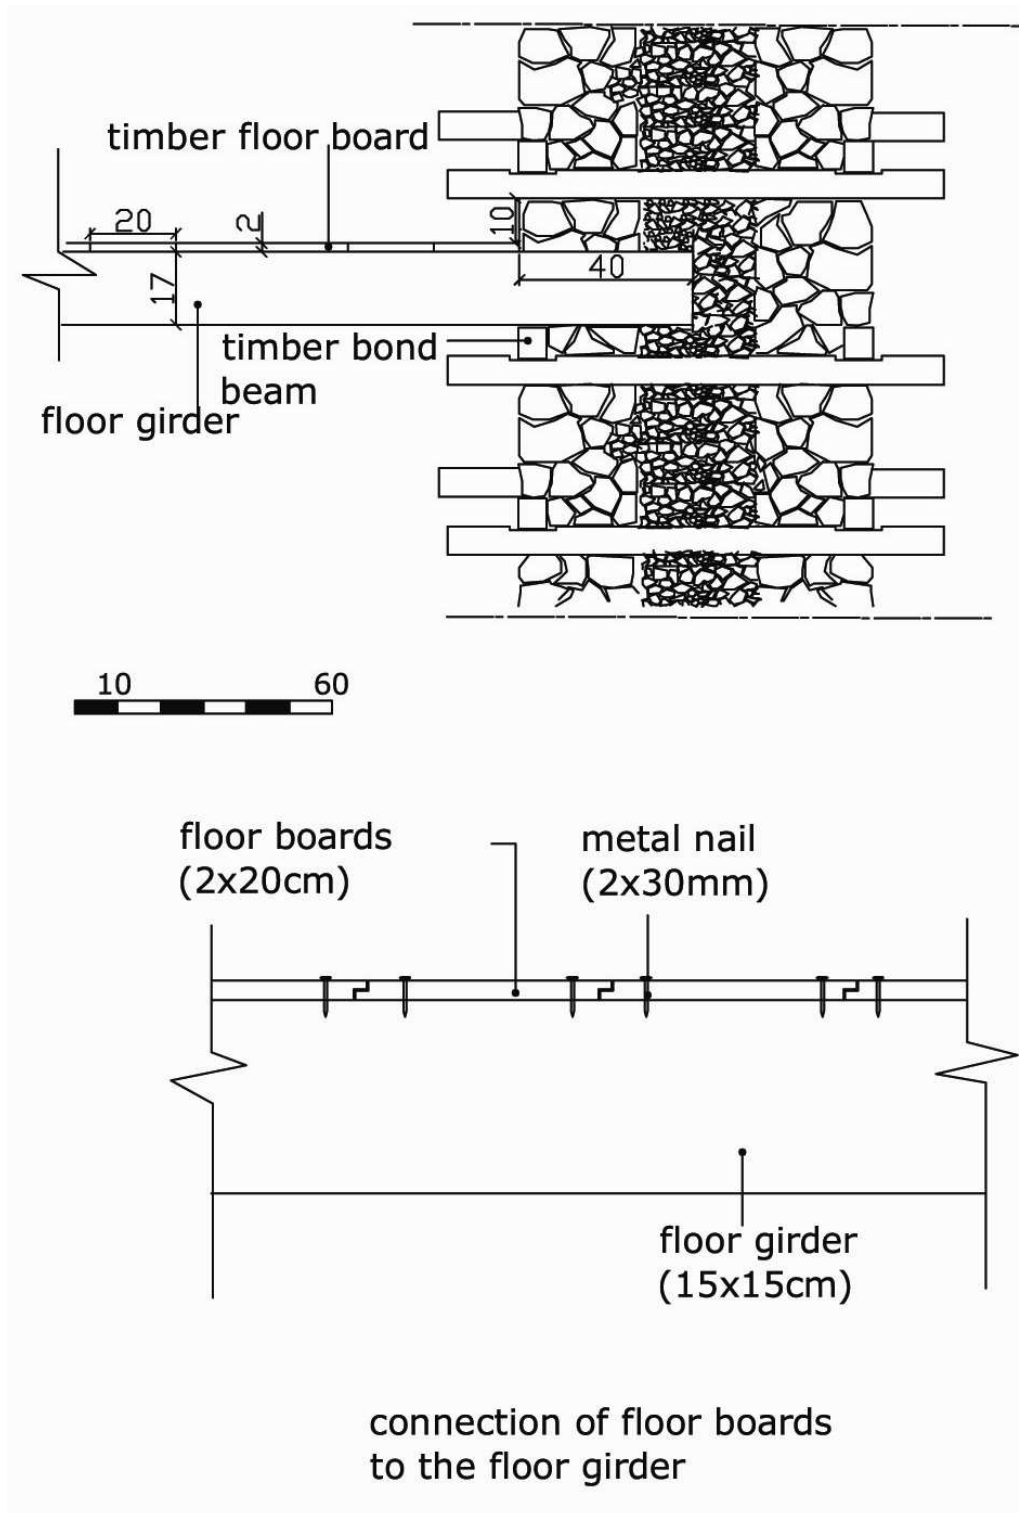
30 Drawing of the floor construction type 2. Çelik 2008.
